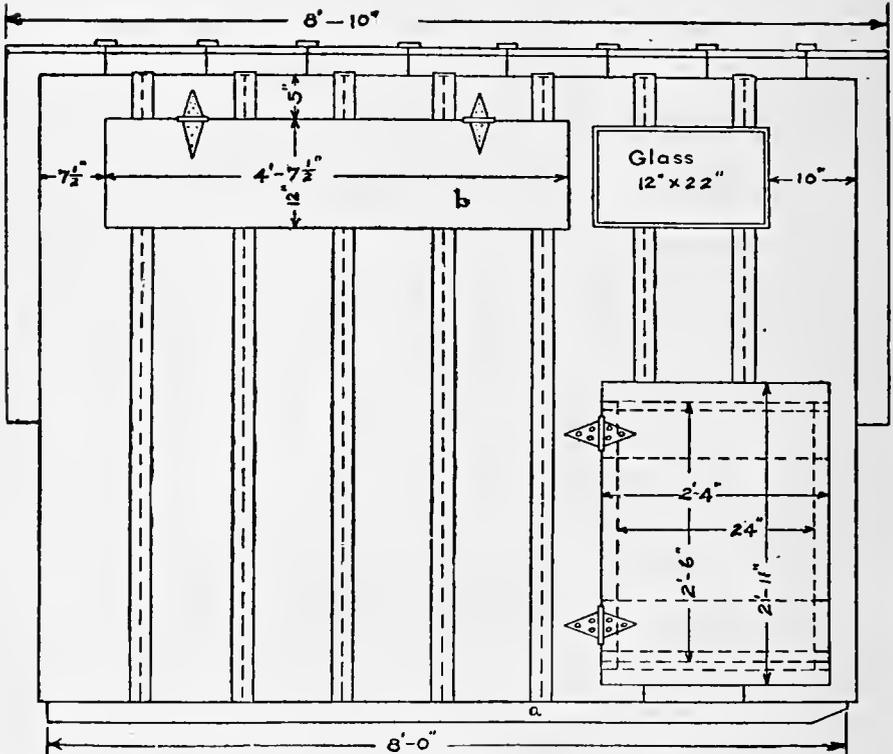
Front Elevation of Shed-Roof Hog House.
